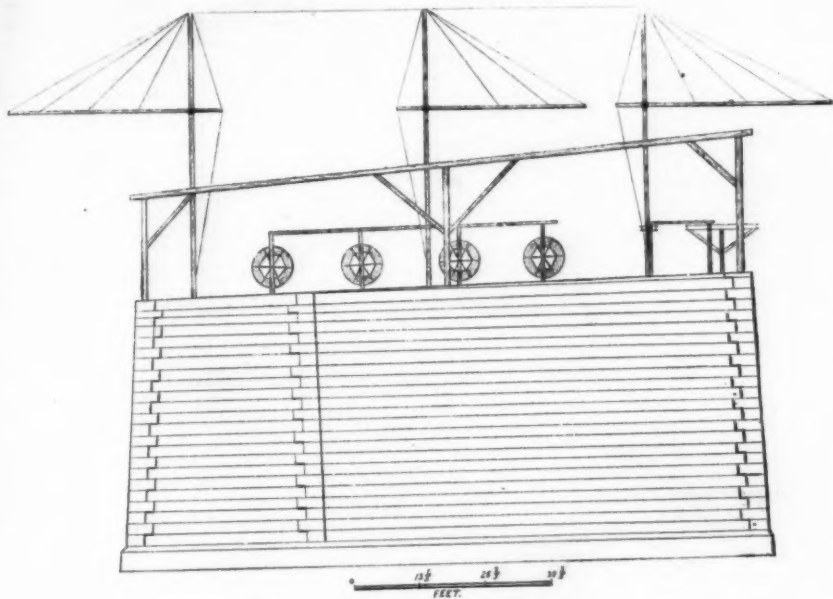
ELEVATION OF BROOKLYN ANCHORAGE.
